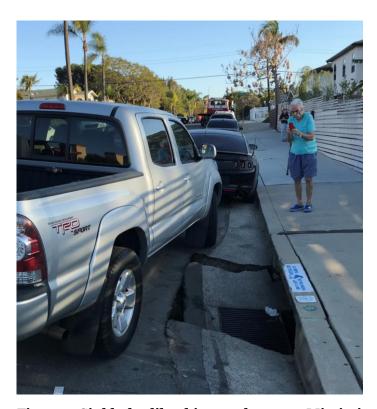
Sinkholes like this one shown on Mississippi Street in April 2021, are caused when stormwater pipes fail and collapse creating unsafe conditions on the surface
